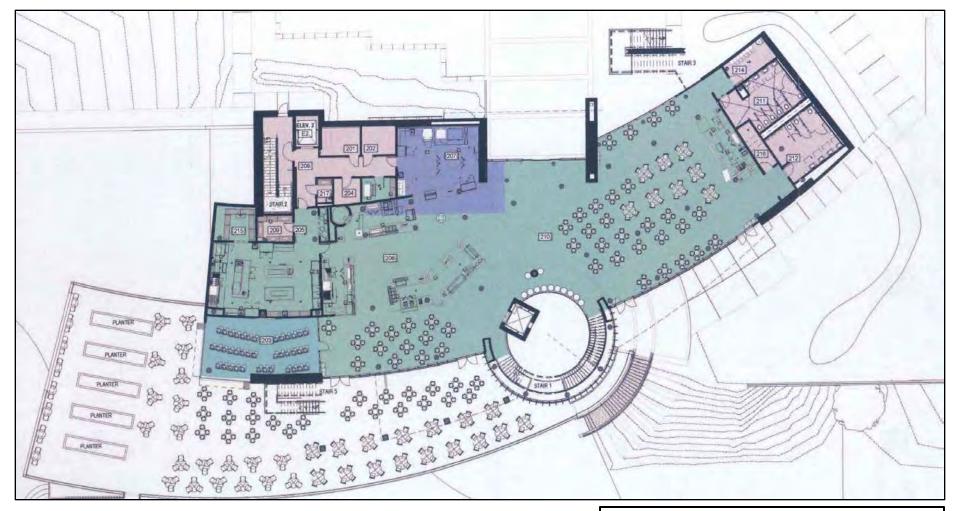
Second Floor Plan for New Campus Center Building PWP-4-CSB-15-0001-2 & CSB-NOID-0003-15
